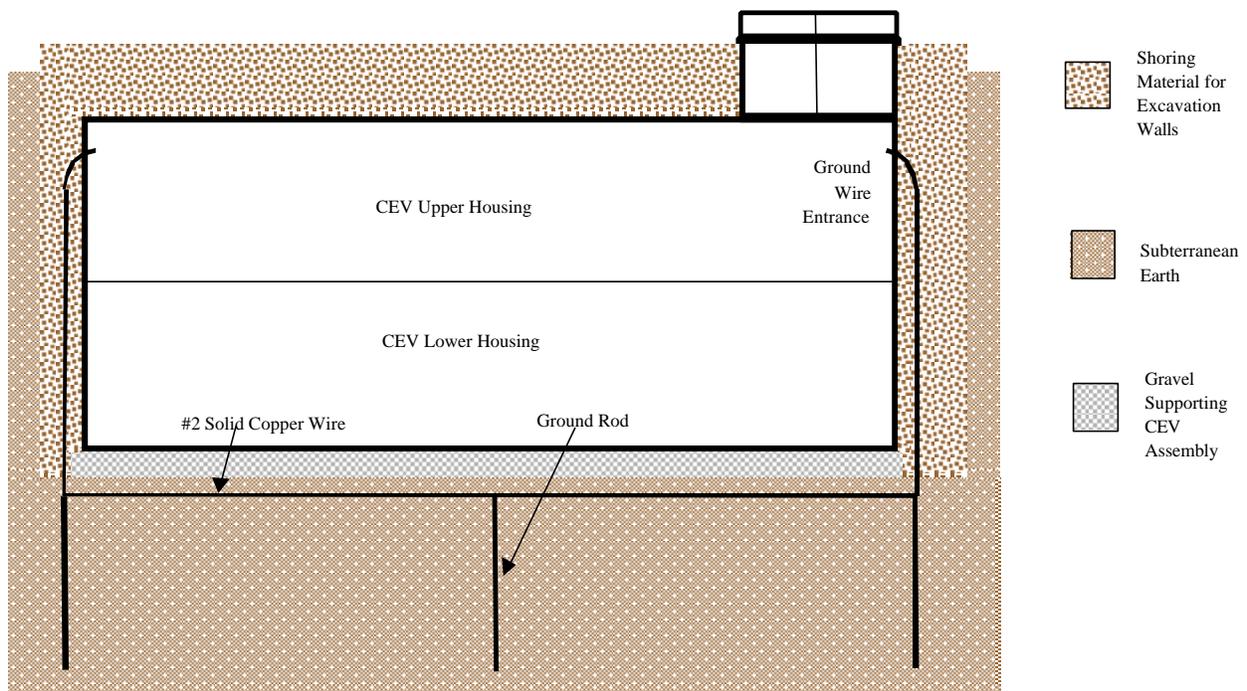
CEV Sectional View of Excavation and Ground Rod Installation
